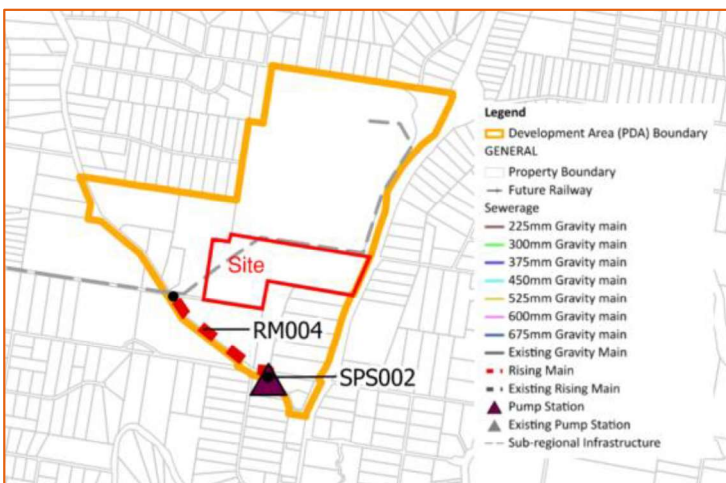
Sewer Trunk Infrastructure in DCOP
